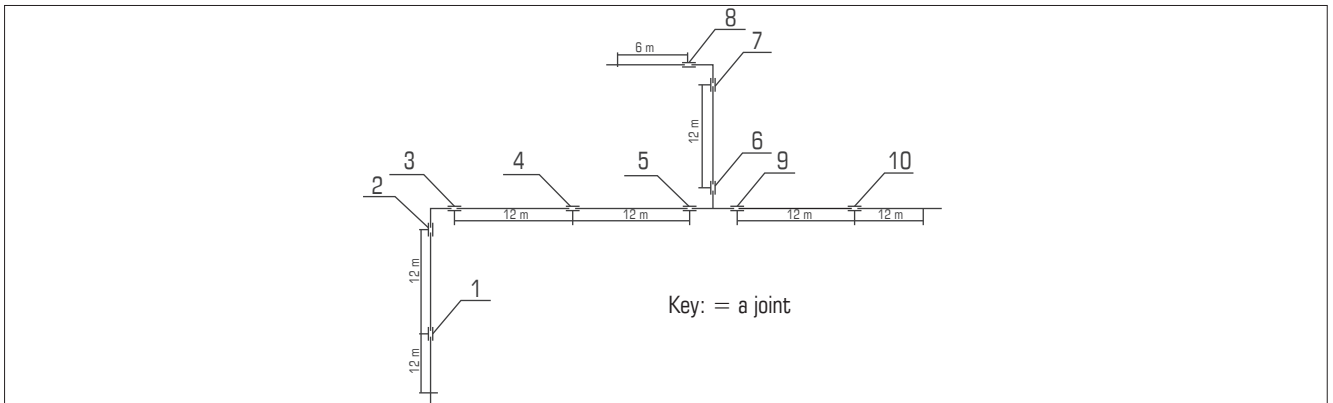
The principle of marking insulated points in the pipeline assembly drawing
